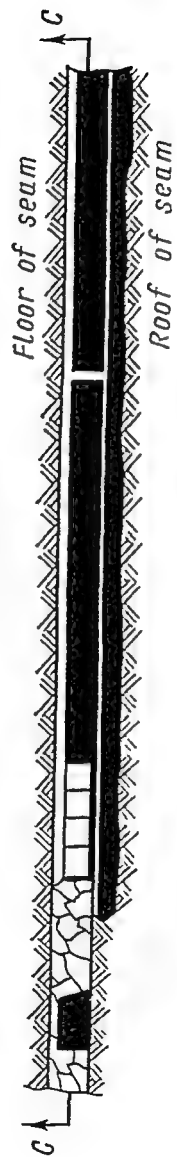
Ventilation layout for the shield method of mining a steep seam
